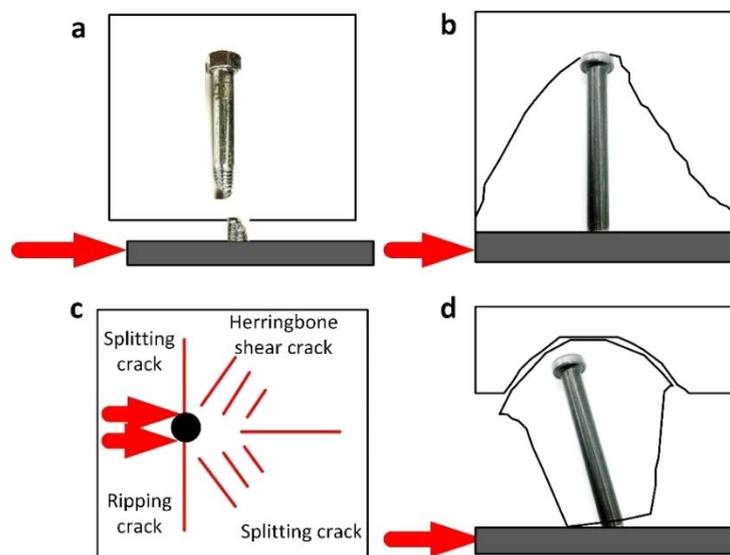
Modes of failure for headed stud connectors: a shank failure; b embedment failure; c slab cracking; d shear failure of slab (adapted and modified from Shim et al. [23])
